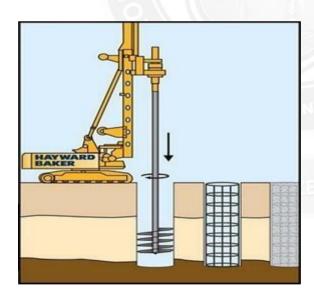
Drilled Shafts or Caisson Foundation (Source: Hayward Baker)
